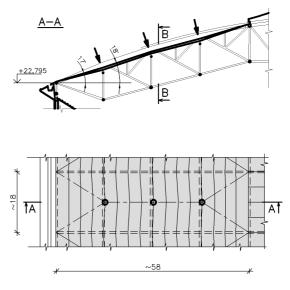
Mounting roof panels of the stadium (worked on [4])
